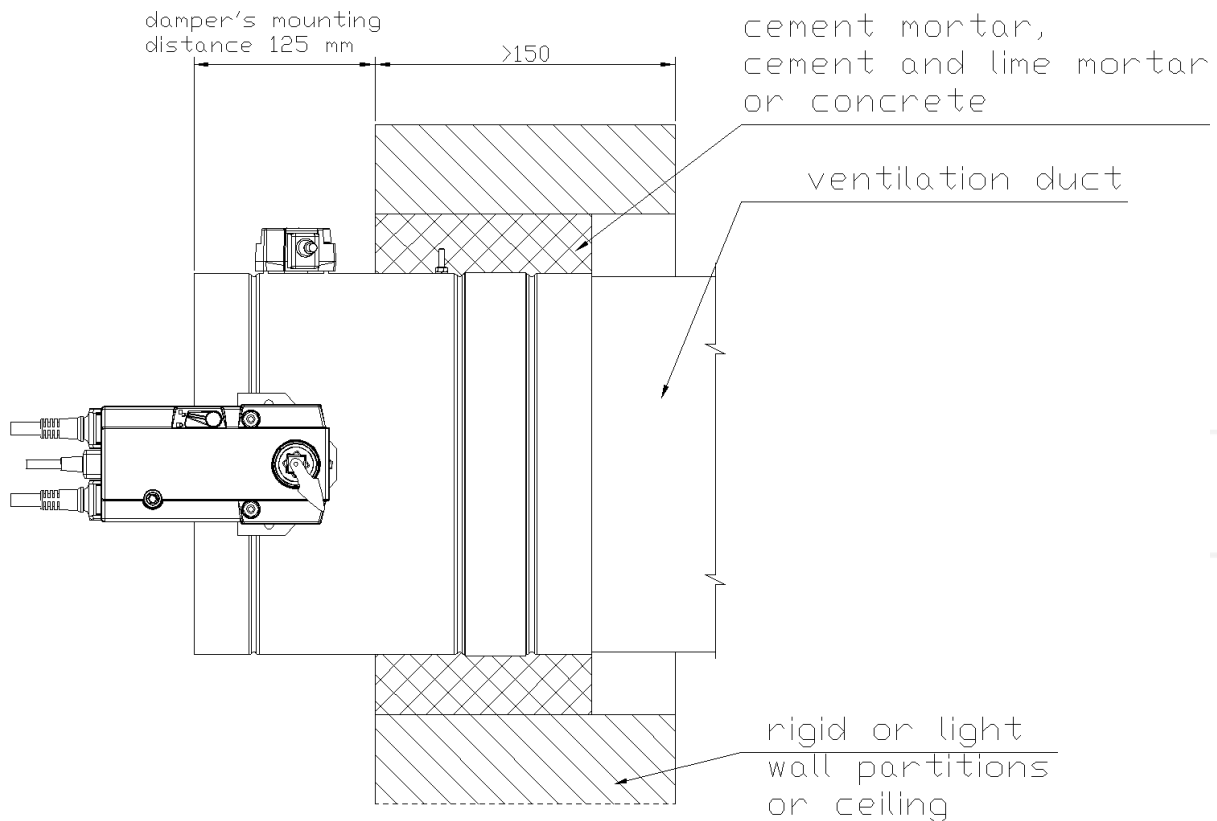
Installation method of fire dampers KTM-O in structures thicker than 150 mm
